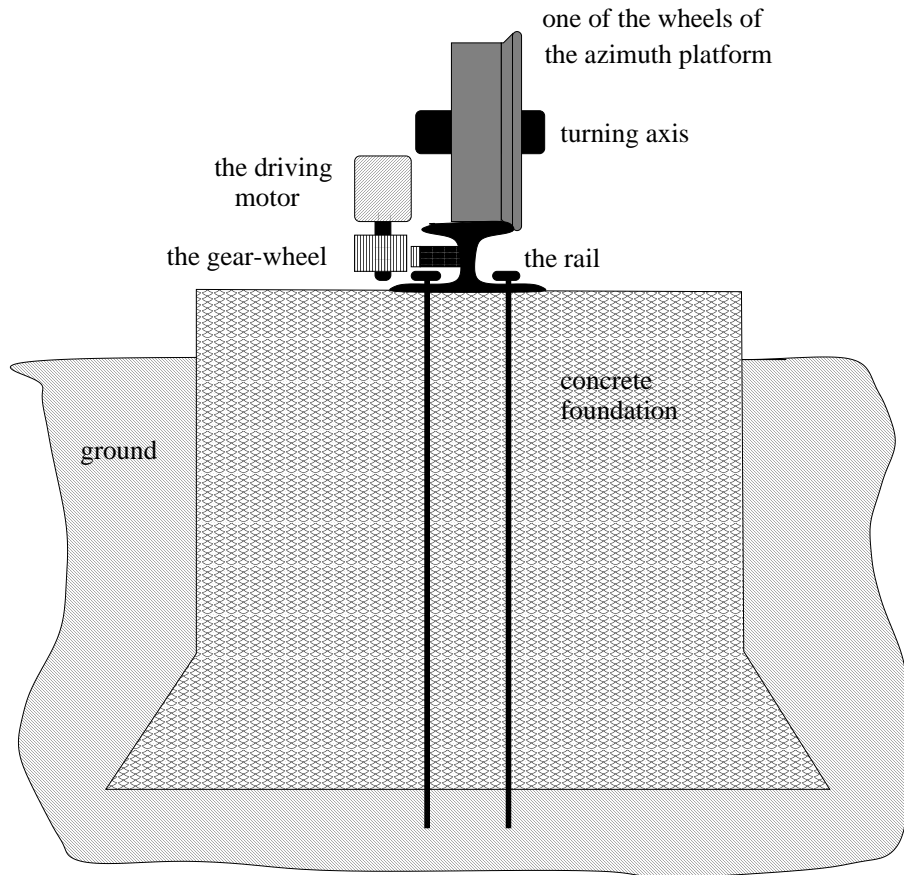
Cross section of the foundation and of the circular rail. The concrete foundation is $\approx 1\text{m}$ in width.
